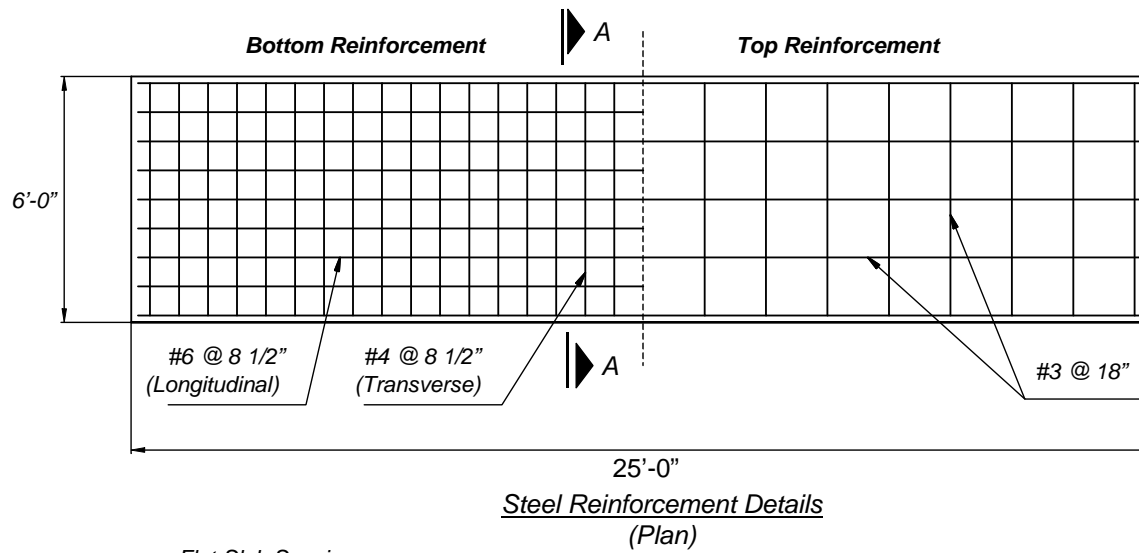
Geometry and Reinforcement Details of Flat-Slab Specimens FS-1 and FS-2
